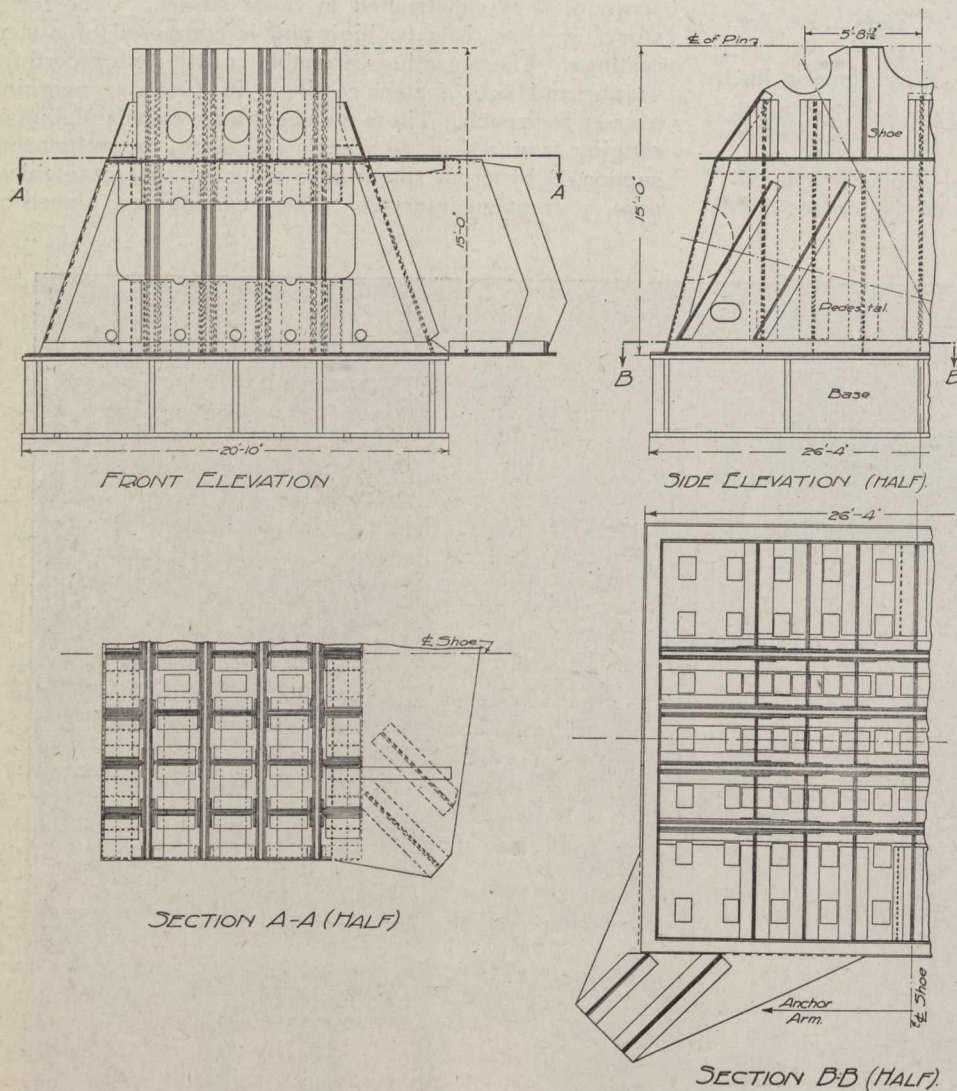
Elevations and Sections of Shoe for Main Pier Bearing.
